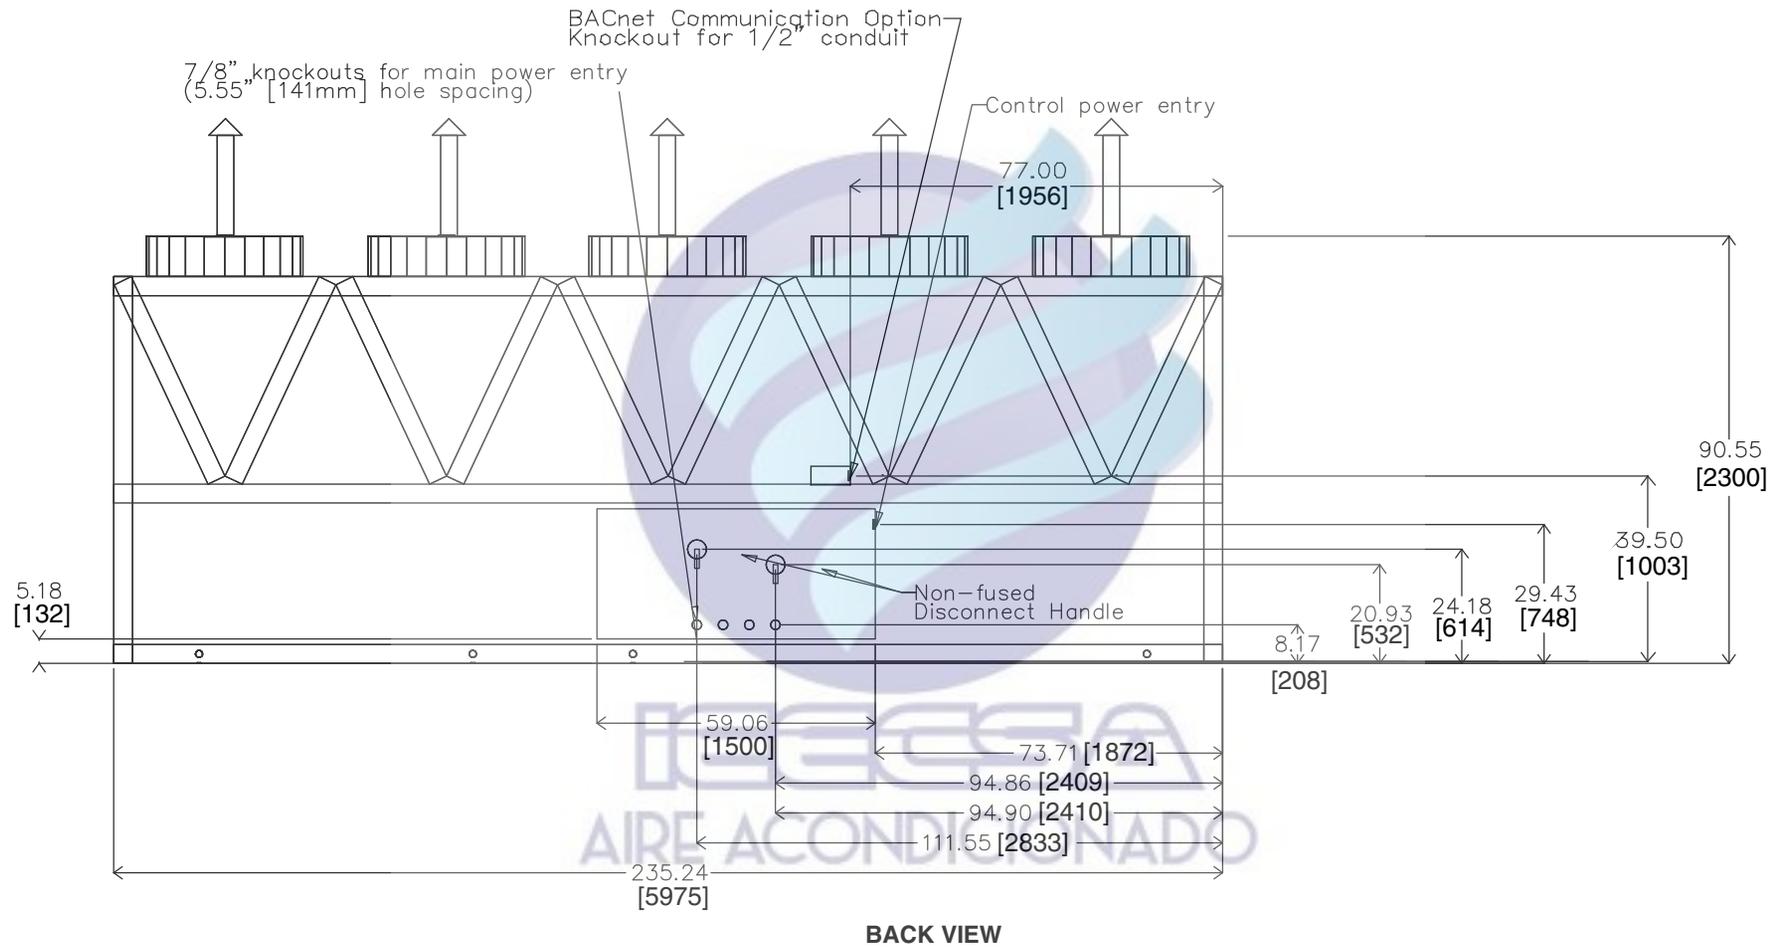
30XA140,160 Air-Cooled Liquid Chiller Dimensions with Pump (cont)
